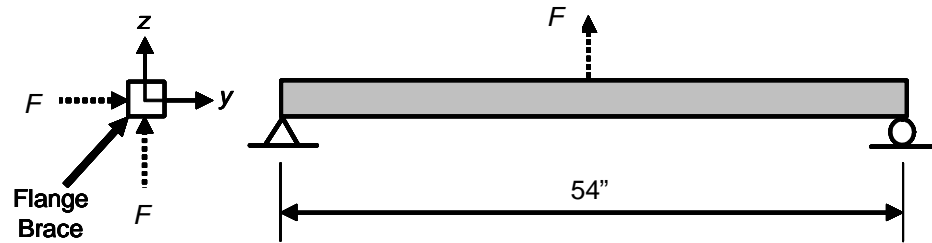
Flange Brace Force on HSS Supporting Beam
